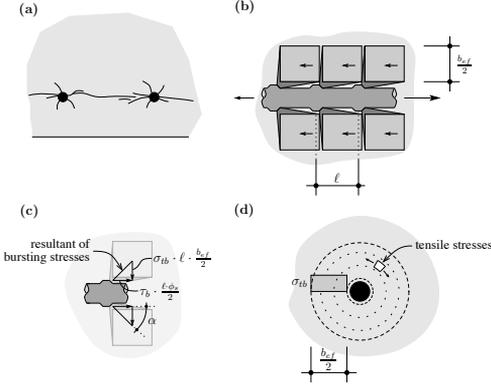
Bond splitting phenomenon: (a) spalling of concrete cover due to splitting (radial) cracks; (b) tension rings and bursting stresses around reinforcement bar; (c) equilibrium of longitudinal forces; and (d) transverse tensile stresses (assuming a constant value of the stress in the tension ring).
